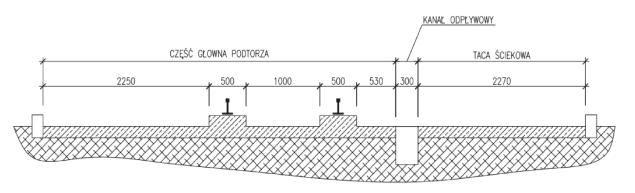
Diagram of the concrete structure of the railway subgrade-stocktaking
